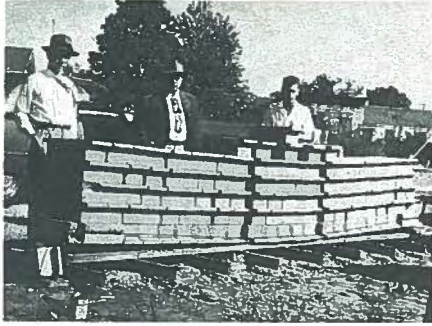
Testing of soffit beam made up by masonry blocks (Tulsa, Oklahoma).
